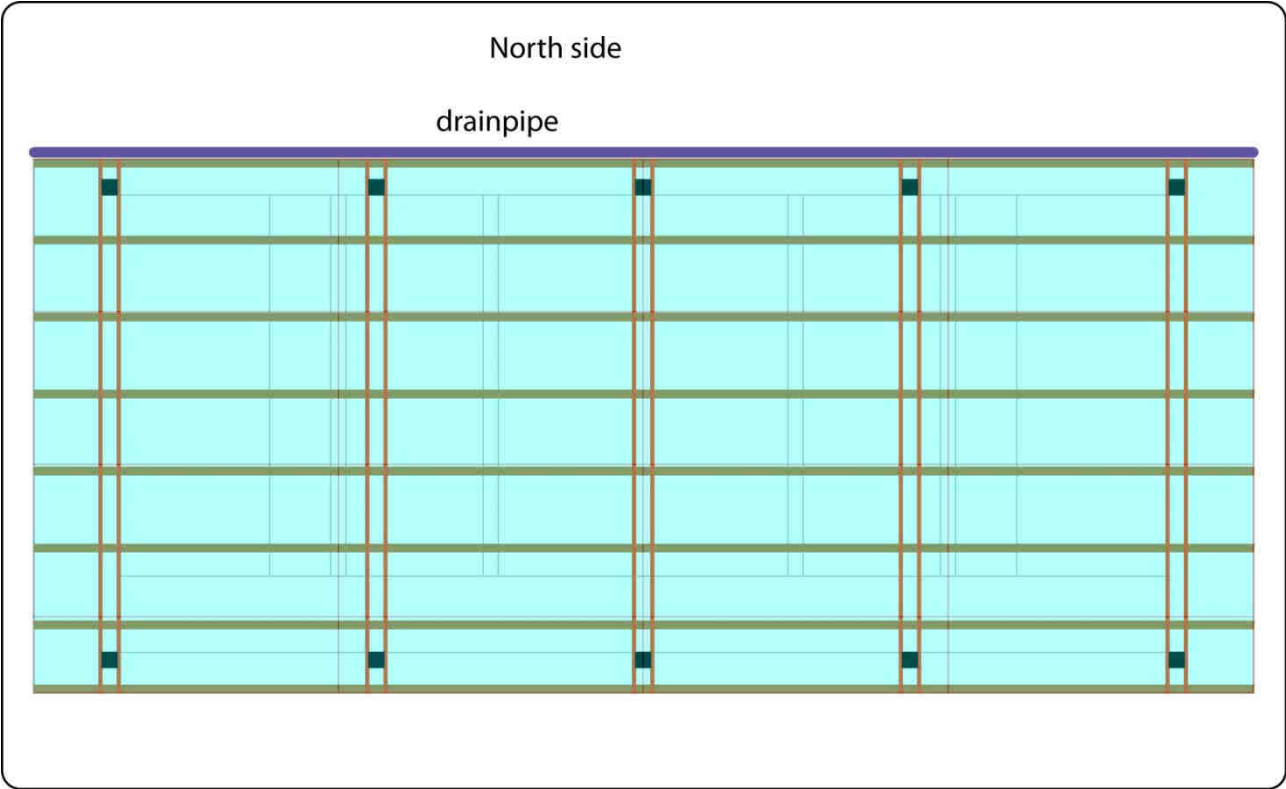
At this point can be added also the drainpipe to collect the rain water and bring it into the water tanks.
